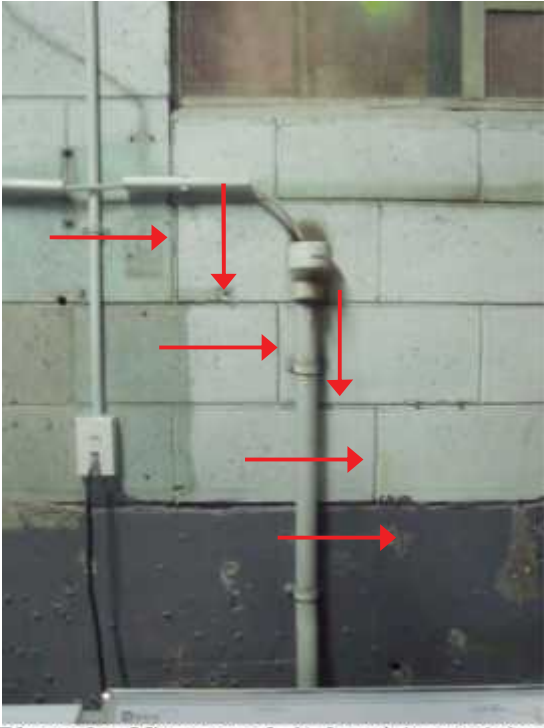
Minor crack (1-2mm) in retaining section of the south-eastern wall, note that it extends up through the block work.
